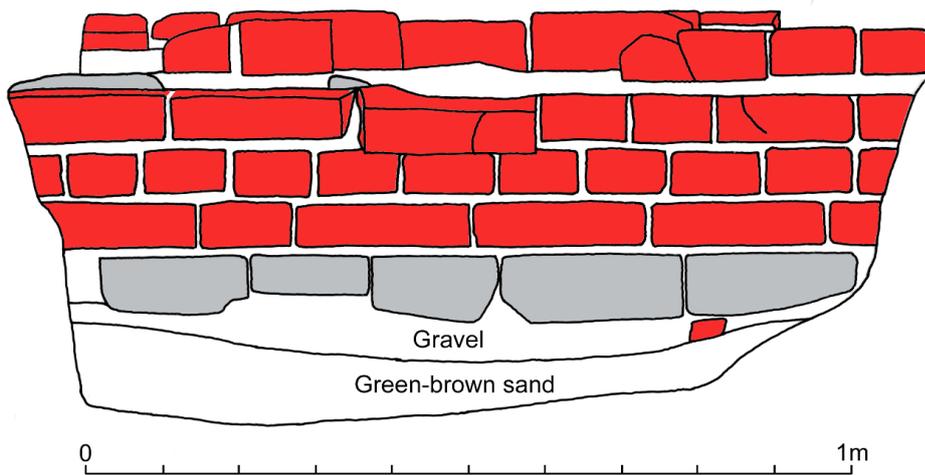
The south face of the retaining wall [CU17] on the north side of the channel.
